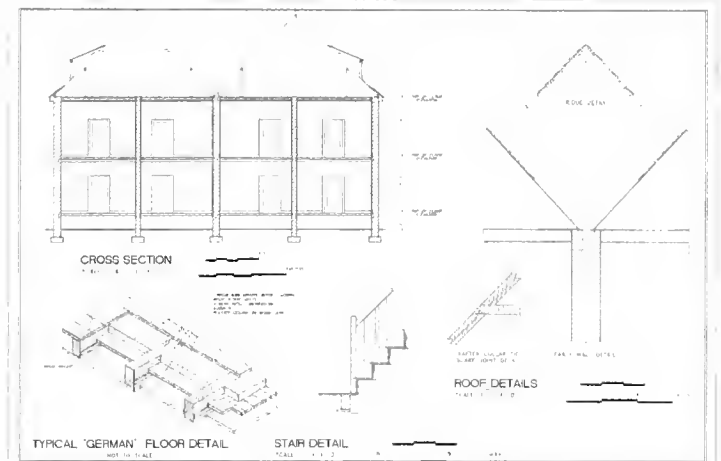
Drawings of Floor and Roof Details, German Village, Dugway Proving Ground
